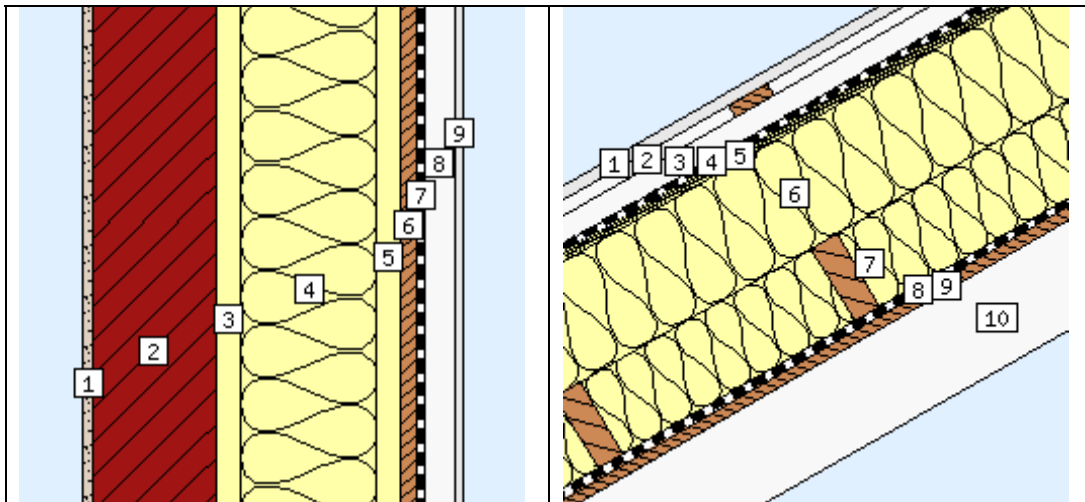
Details of exterior insulated wall and roof – the numbers show the different layers. Wall 1 Lime cement plaster, 2 Brick chipping concrete wall, 3-4-5 Mineral wool or Flax between different thick wood C-posts, 6 Wood shuttering with 1mm gaps between boards, 7 Open diffusion PE wind sealing with windproof glued joints, 8 Rear ventilation between upright wood lathes, insect screen, 9 Fiber cement panels. Roof: 1 Covering, 2 Lathes 3/5, Ventilation between cross lathing 5/5, 4 Open diffusion roofing sheet, sealed (windtight), 5 Porous wood fiber inside roofing layer, 6 and 7 Mineral wool or Flax insulation panels between vertical and horizontal lathes, 8 PE vapour barrier, 9 Exposed shuttering - tongue and groove, 10 Freely visible rafters (Reference: IBO - Austrian Institute for Healthy and Ecological Building, 2009)
